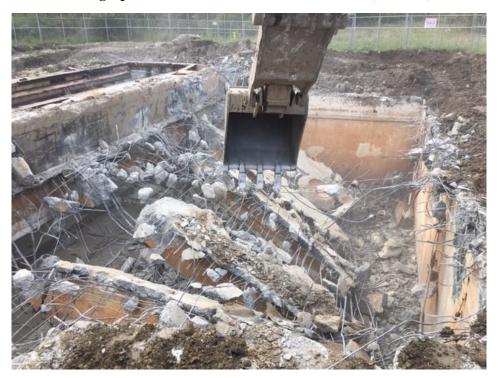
Excavation of side wall at Silo 2 and covered soil pile (9/4/18).
